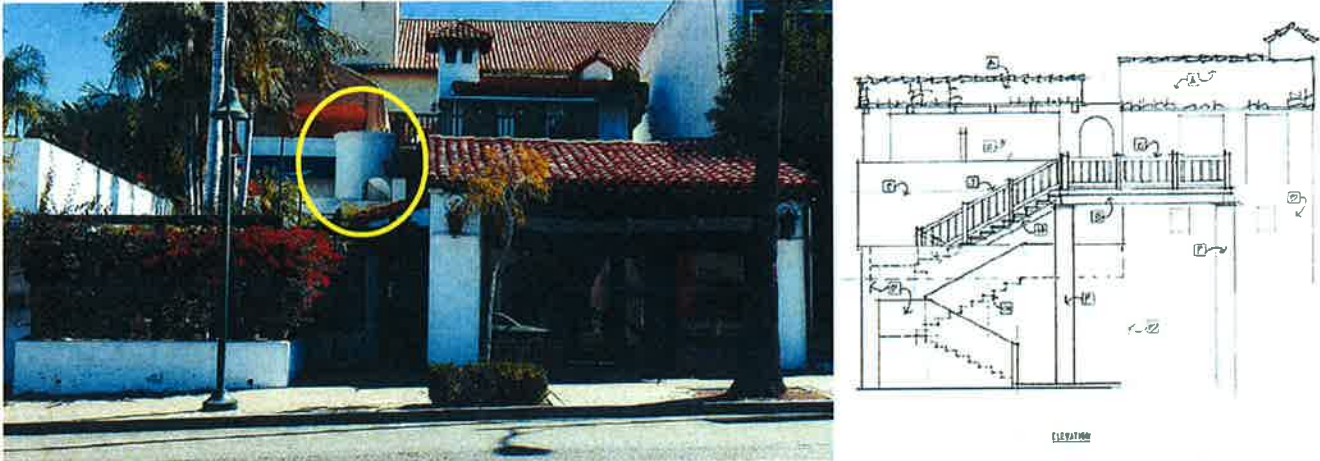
Existing spiral staircase alongside elevation of proposed wood staircase
